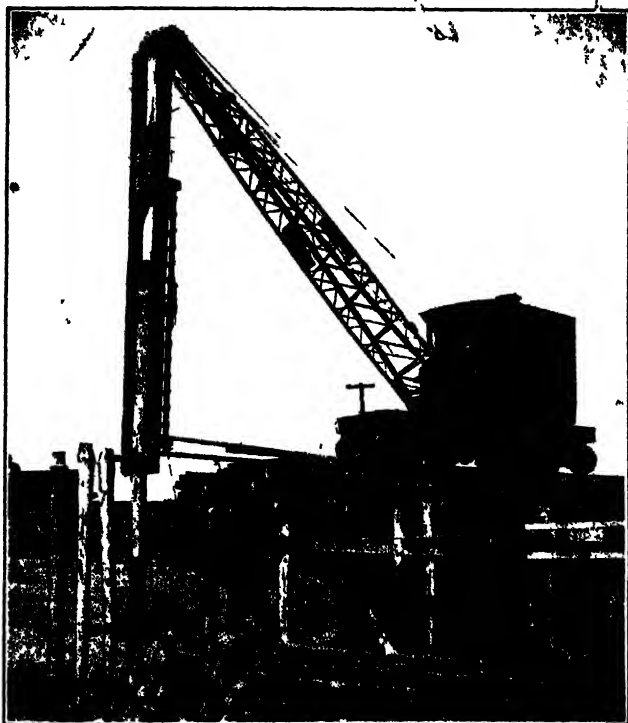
Locomotive Crane Used as a Traveler and Pile-Driver in Building a Pile Trestle.
